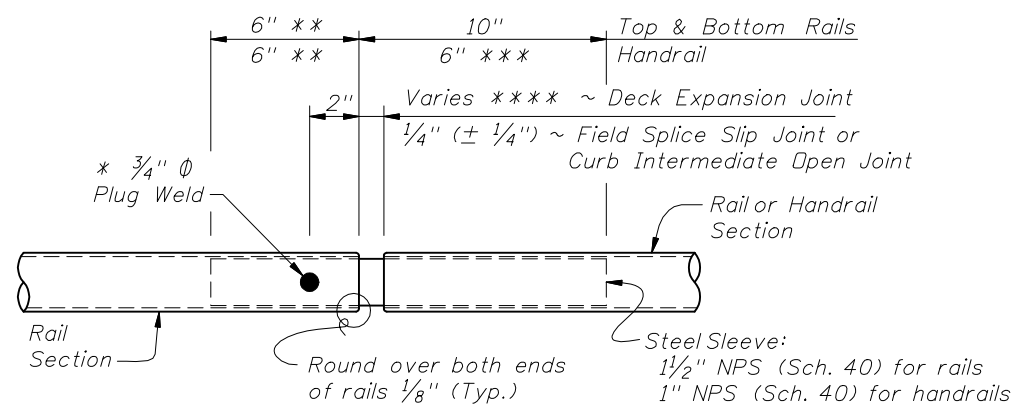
DETAIL "A" - SECTION AT INTERMEDIATE OPEN JOINT
